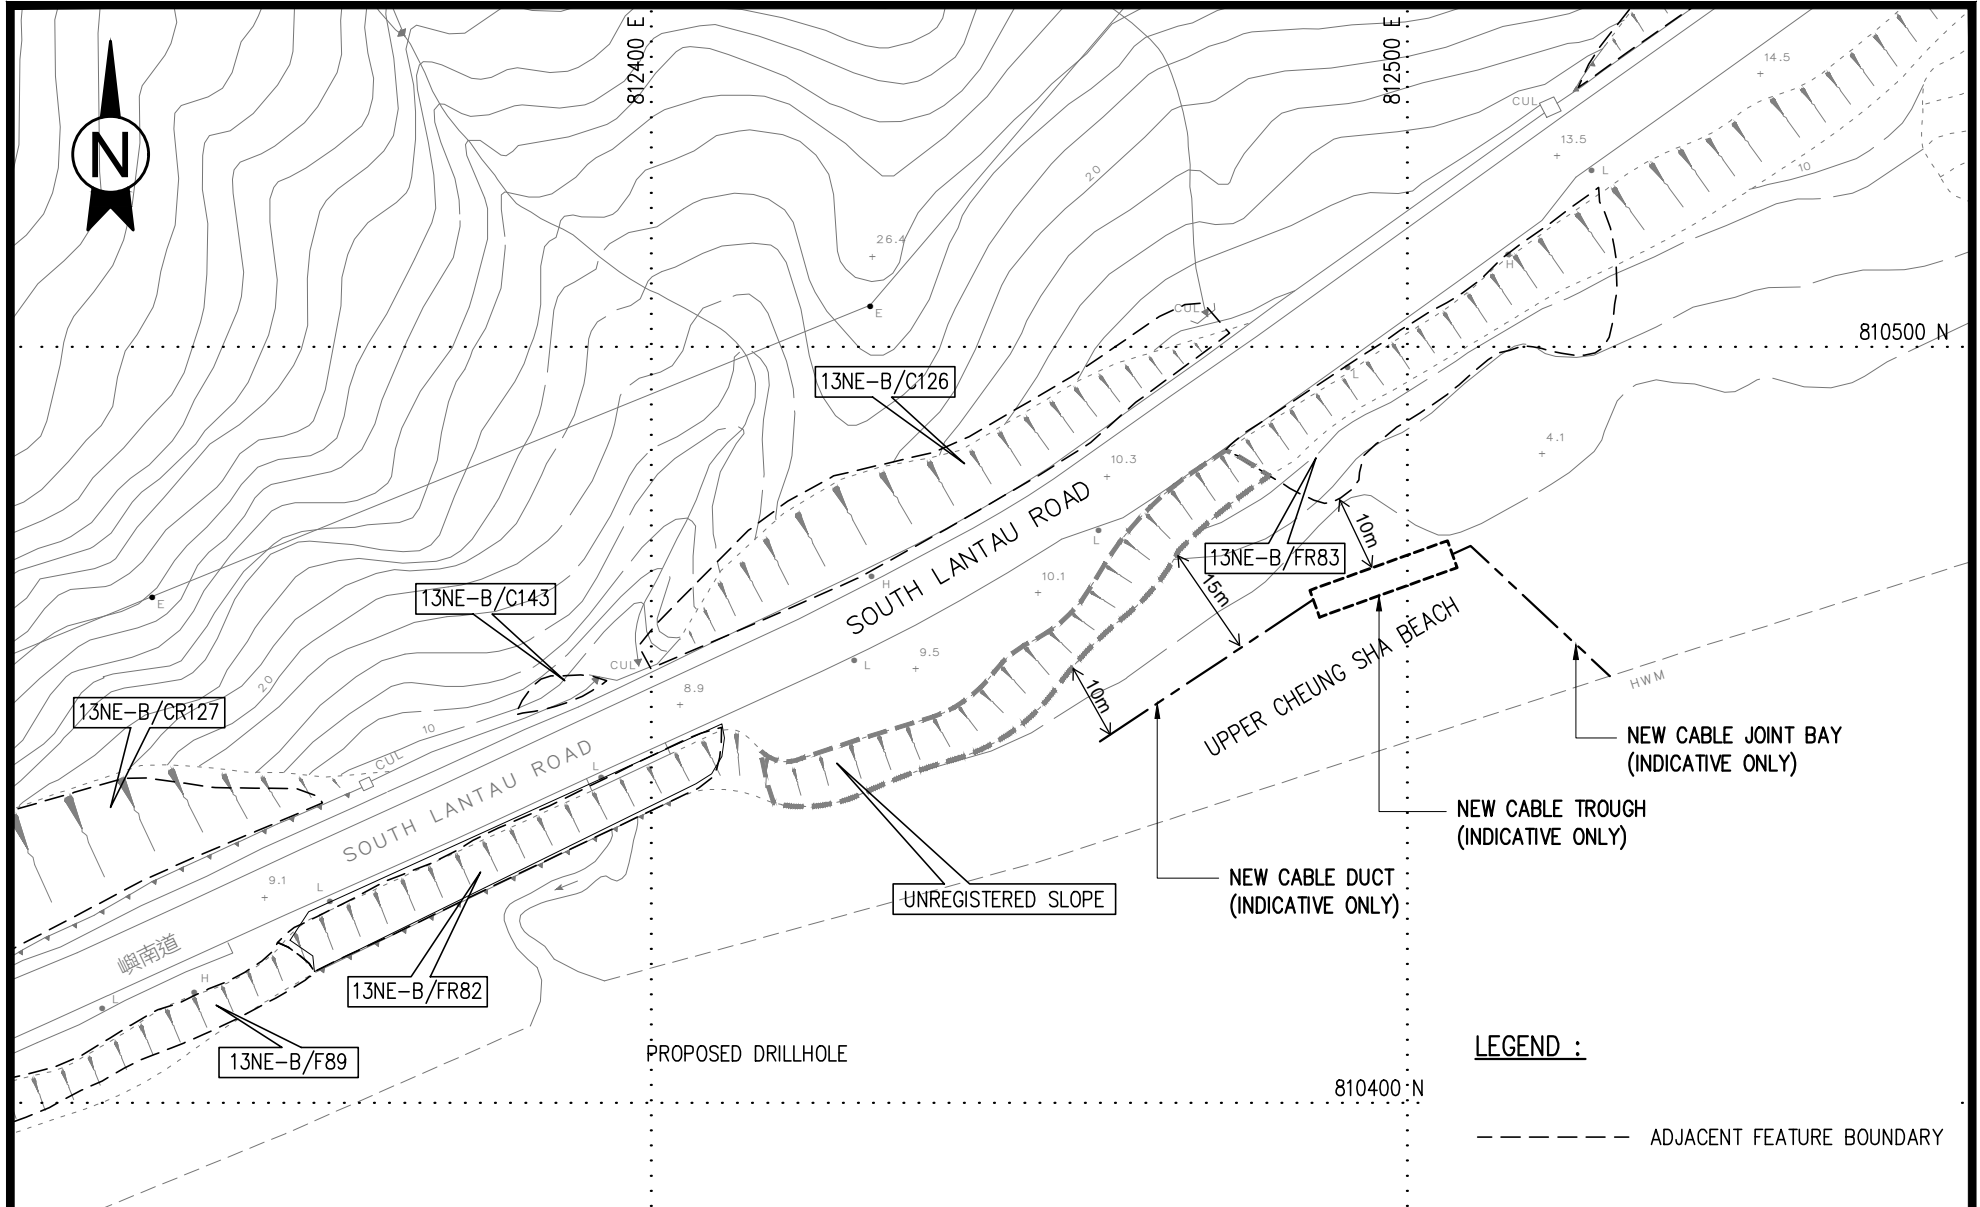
Site Location Plan of Cable Joint Bay, Cable Duct, Cable Trough and Cable Marker
